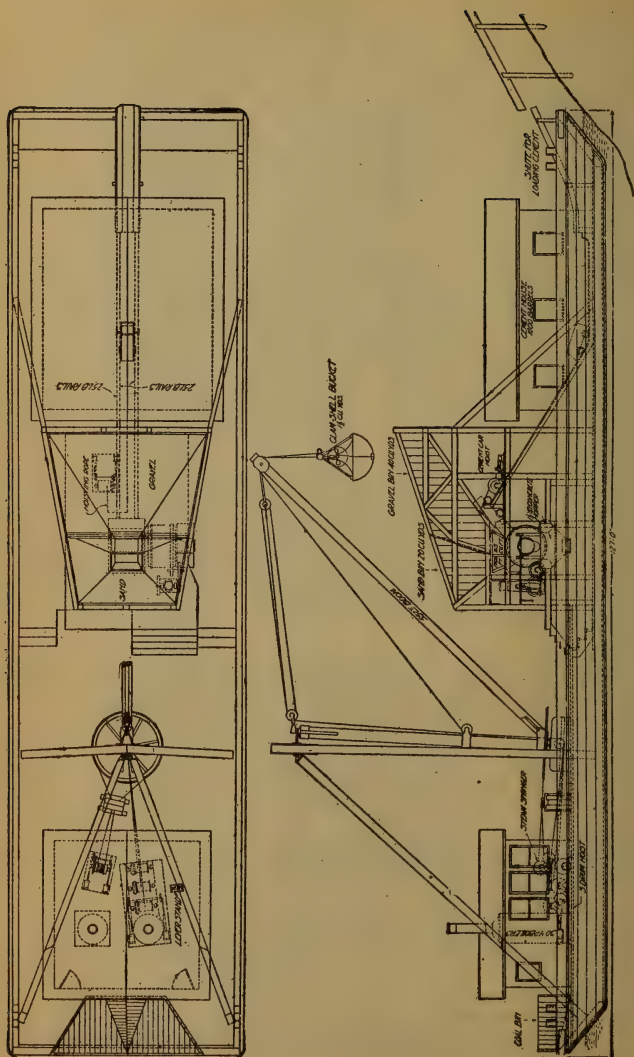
General Plan of Floating Concrete Mixing and Handling Plant.
